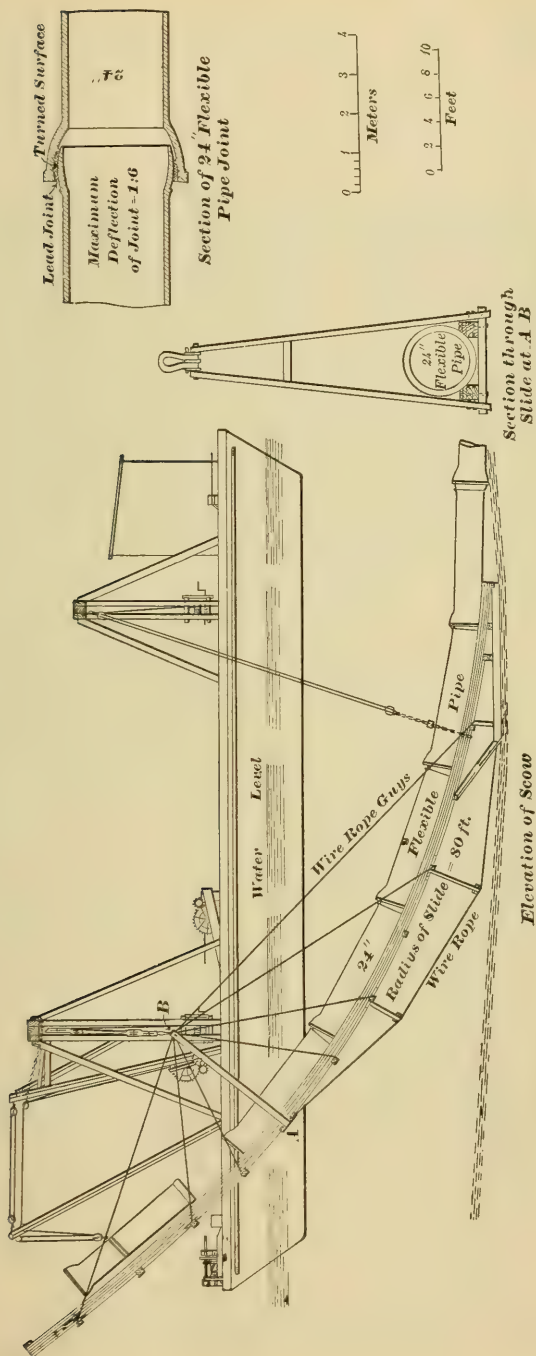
PLATE VII. ELEVATION AND SECTIONS OF PIPE-LAYING SCOW, CHELSEA CREEK, 1900.
